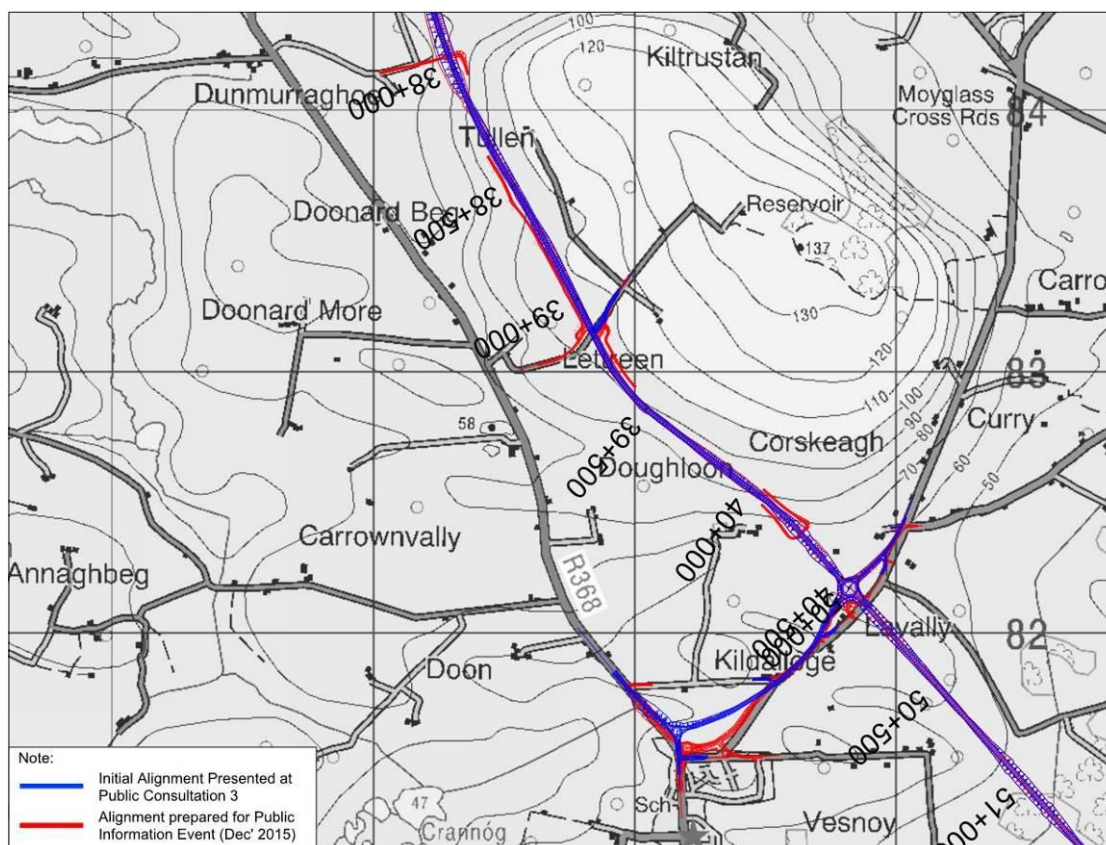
Alignment Development Section C – Ch. 38+000 to Ch. 41+000
